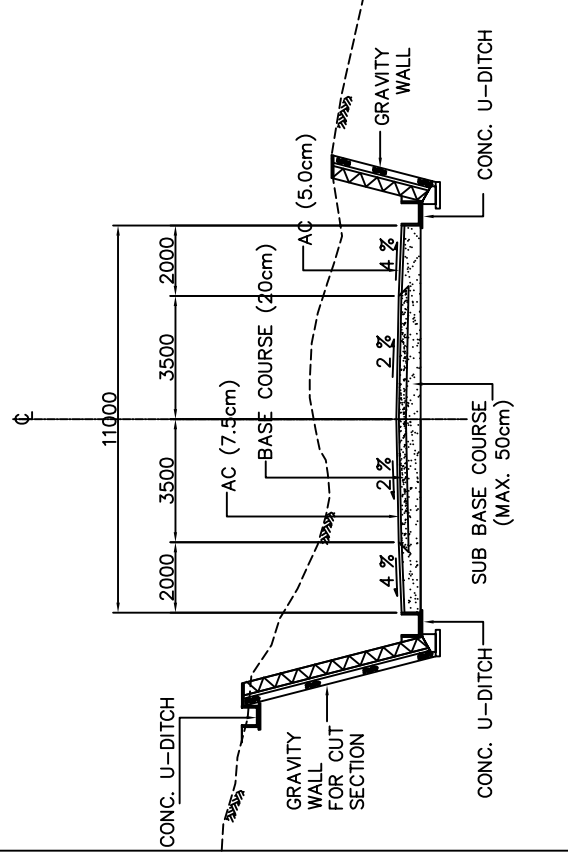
(5/5) TYPICAL CROSS SECTIONS
